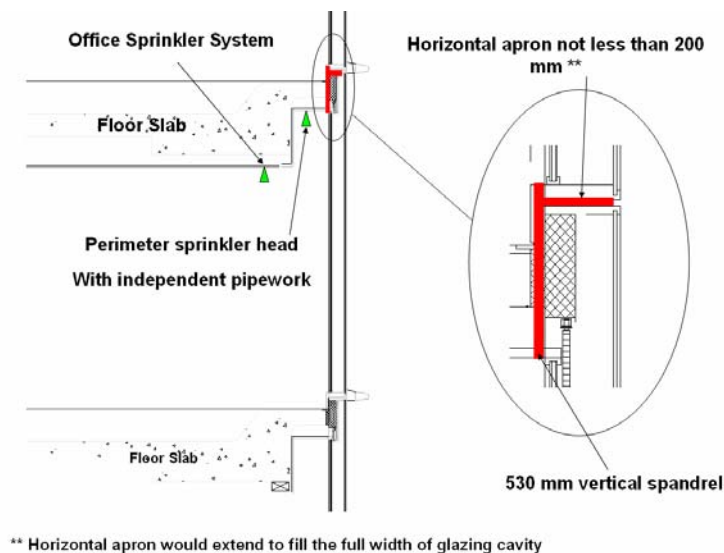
Cross Section through the Building Facade Showing the Location of Spandrel and the Sprinkler Head Along Building Perimeter
